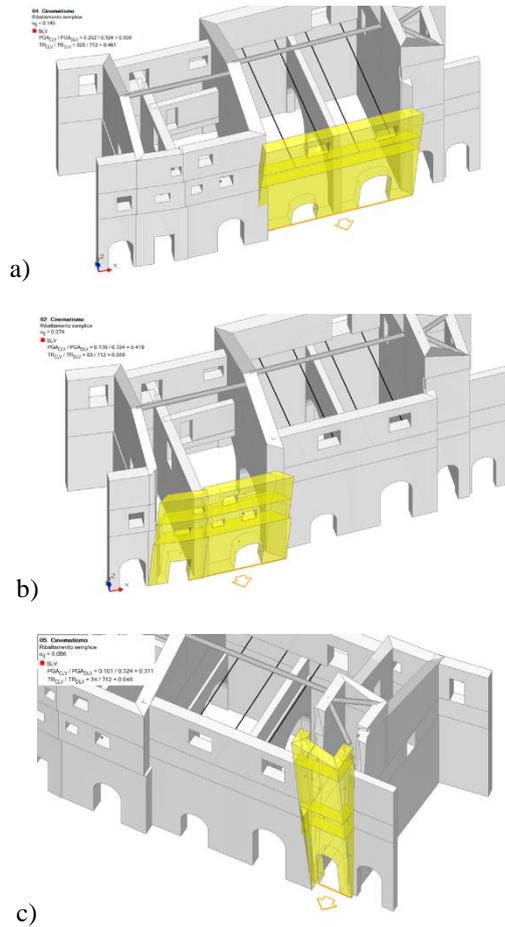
Collapse mechanisms: a) Facade of US-01, b) Facade US-02, c) Bell Tower
